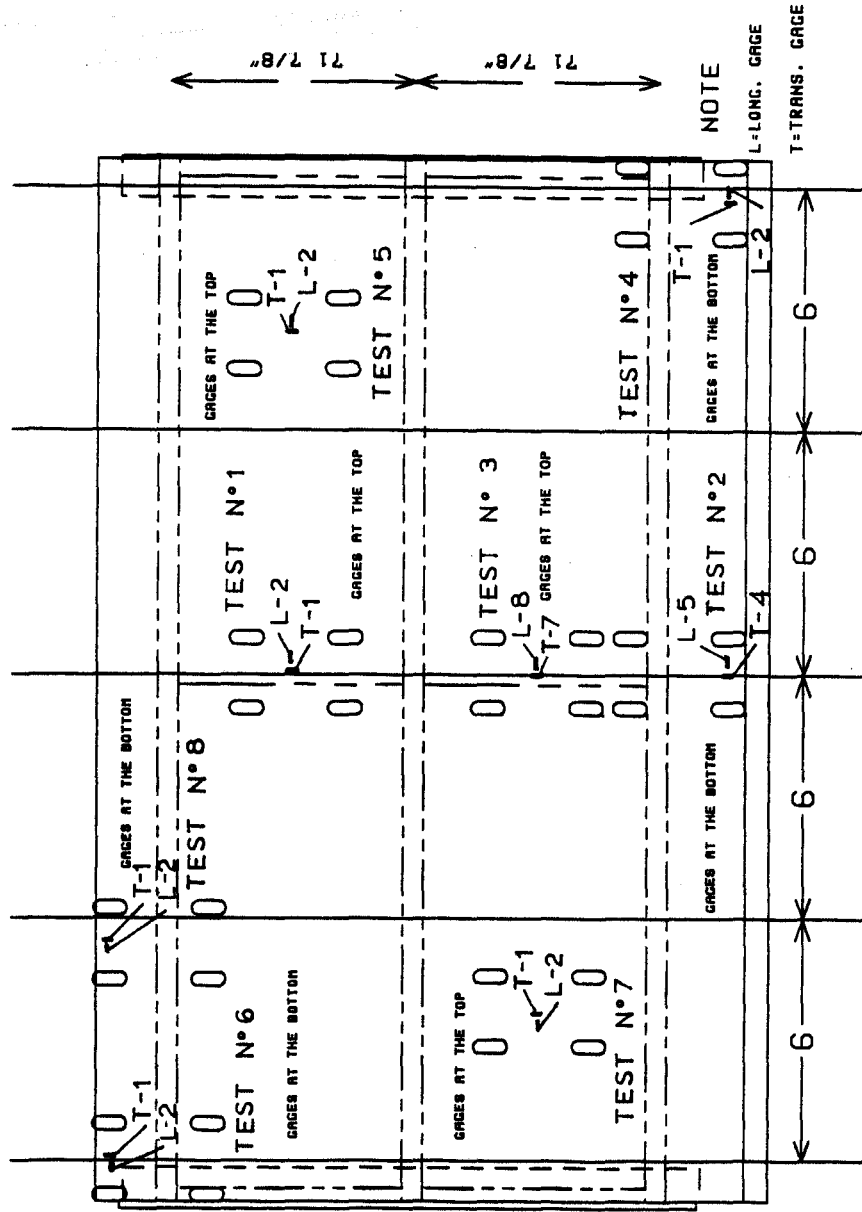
Concrete Strain Gage Locations (Third Bridge)
